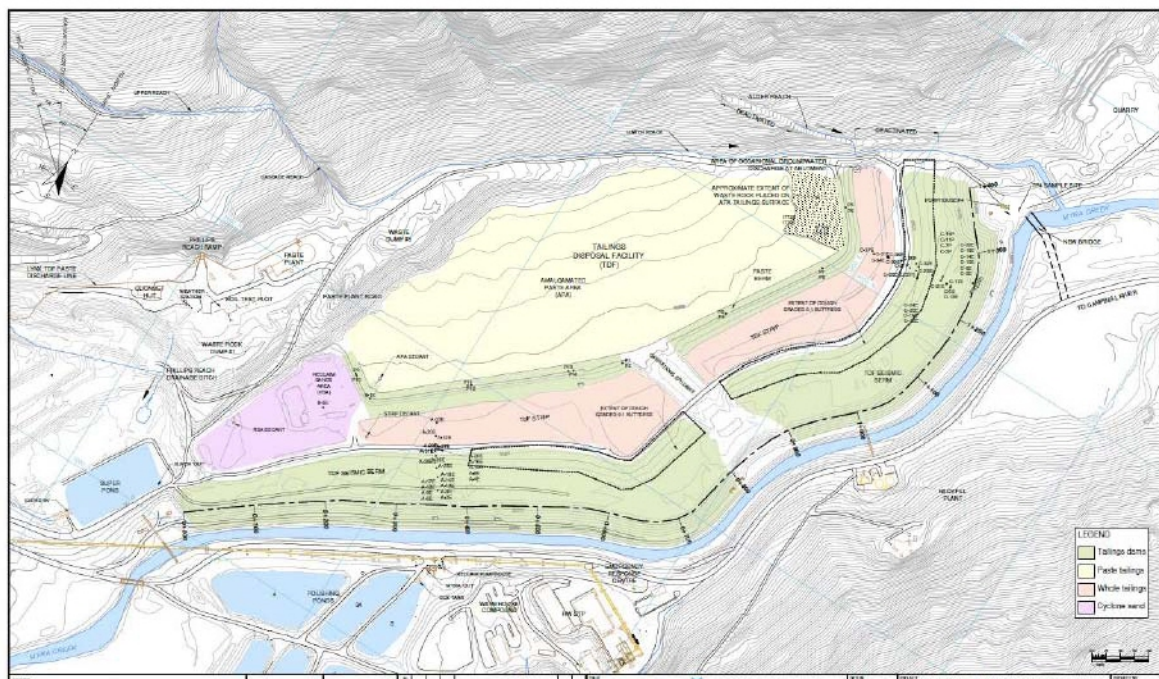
The general layout of the TDF. The yellow shading denotes the paste tailings surface area; the pink shading denotes the old slurry tailings surface area; the purple shading denotes the reclaim sand area (RSA); the green shading denotes sideslopes—the northern one being the paste berm sideslopes and the southern one being the seismic berm sideslopes; Blue shading is Myra Creek.
